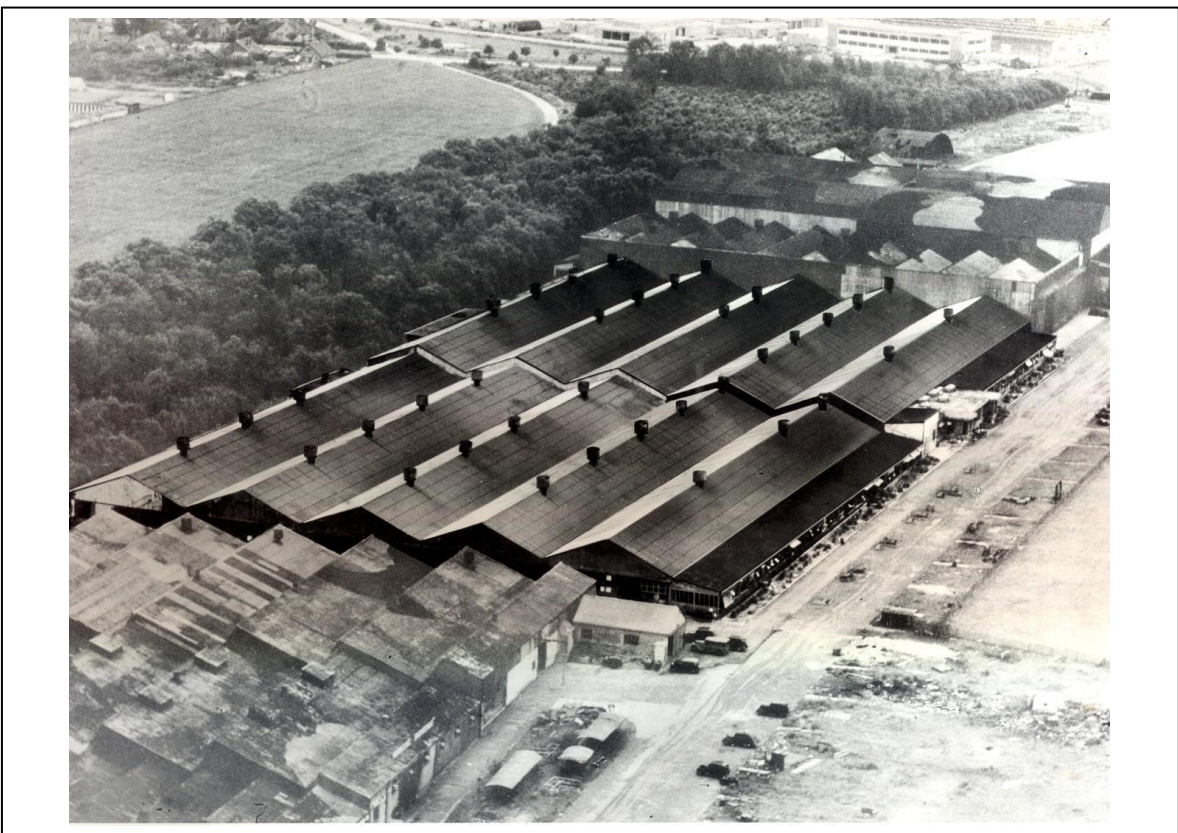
This picture is looking North in 1938 showing 25' Hangar extension being built for construction of Stirling Bombers. The 40' Hangar is already in place
